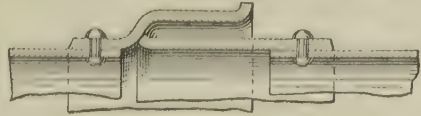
The Riley Socket Joint for Riveted Steel Pipes
